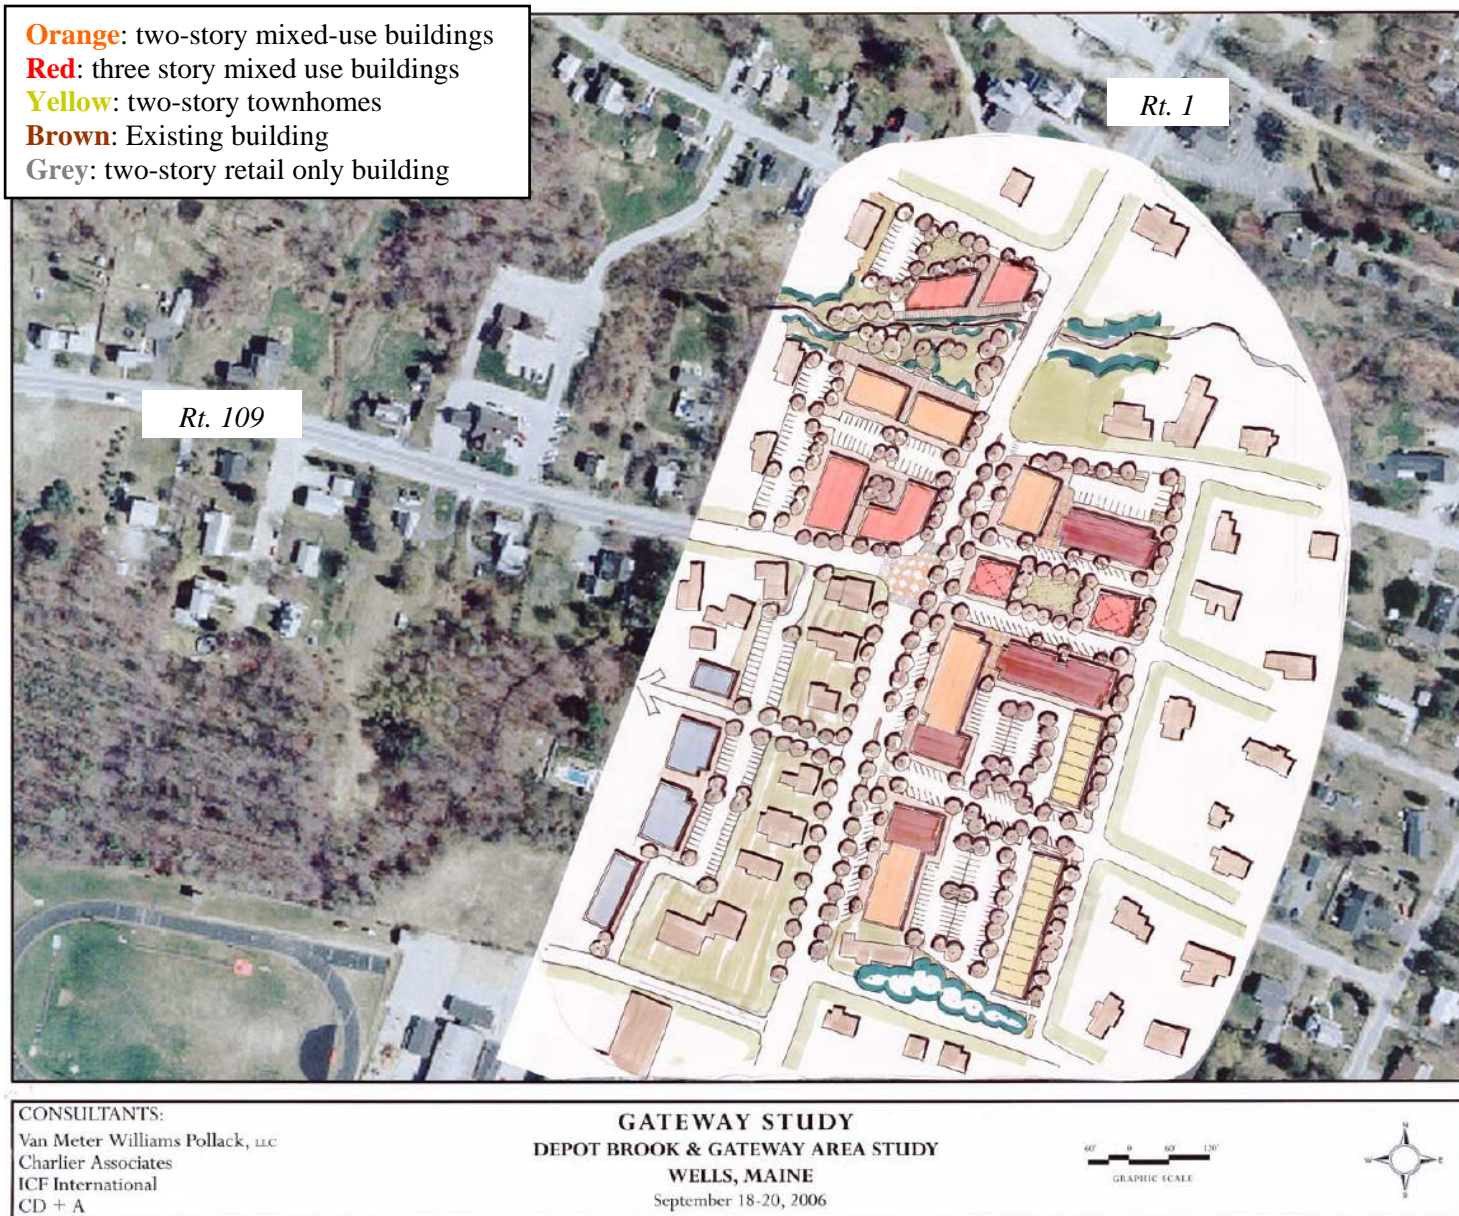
Concept plan for Wells Corner pedestrian district.
